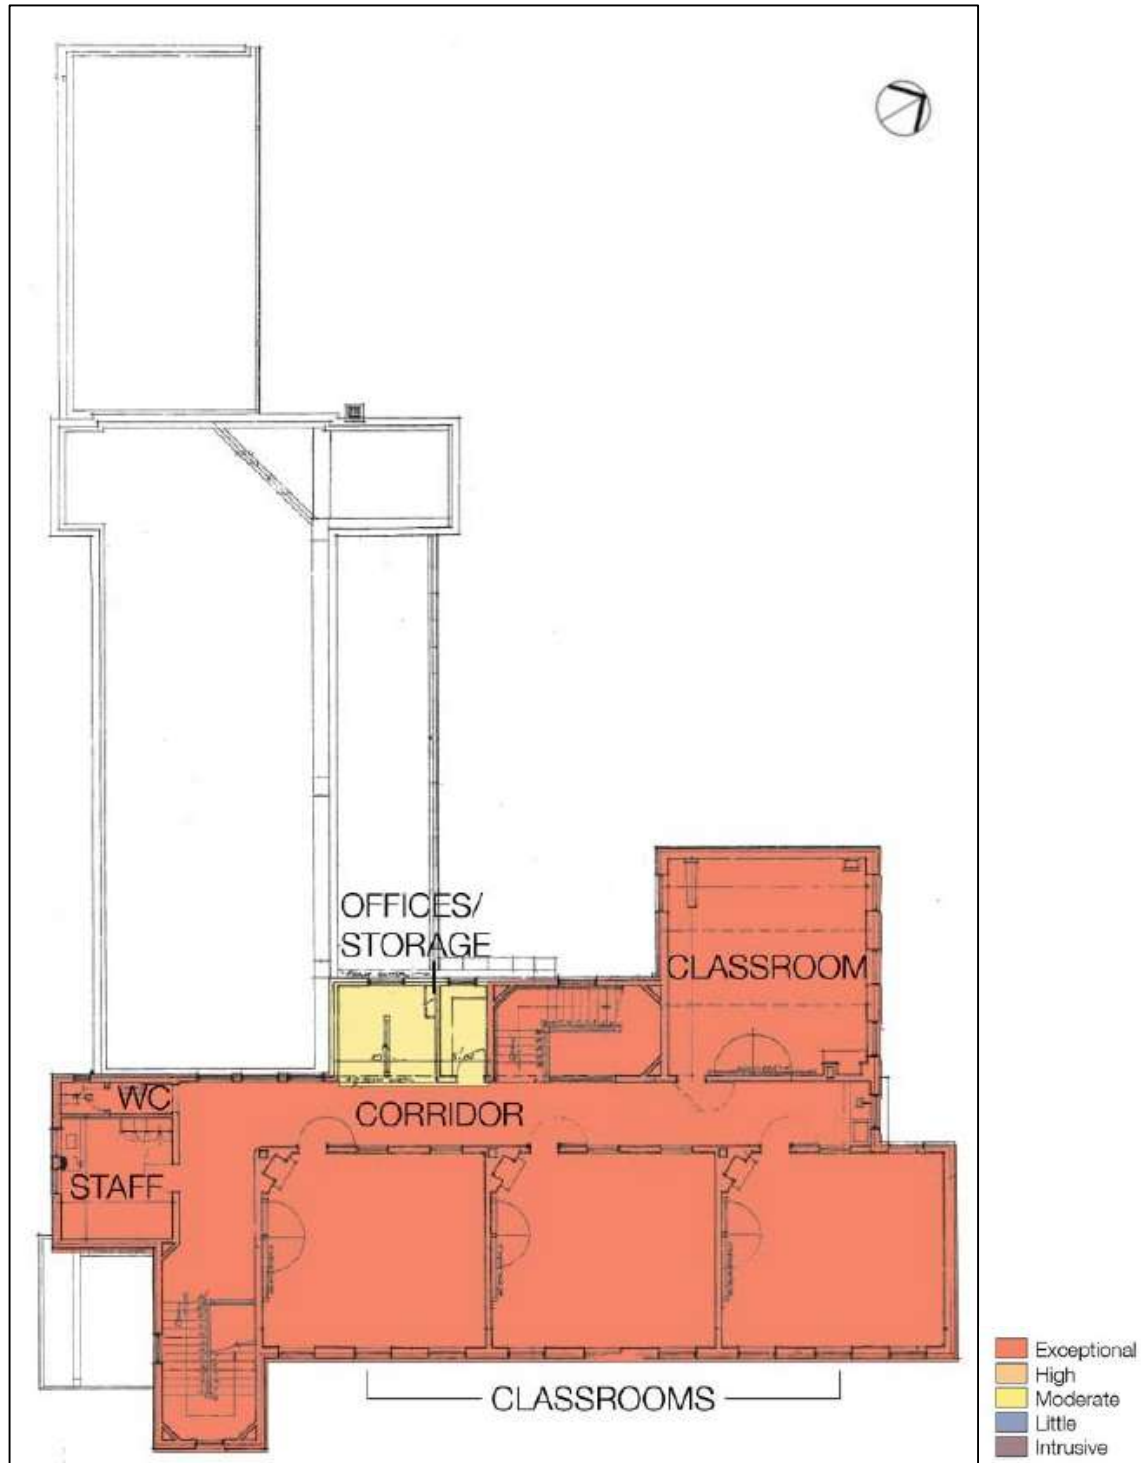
Significance of spaces in Fort Street Public School – First Floor (Source: TKD Architects 2016)
